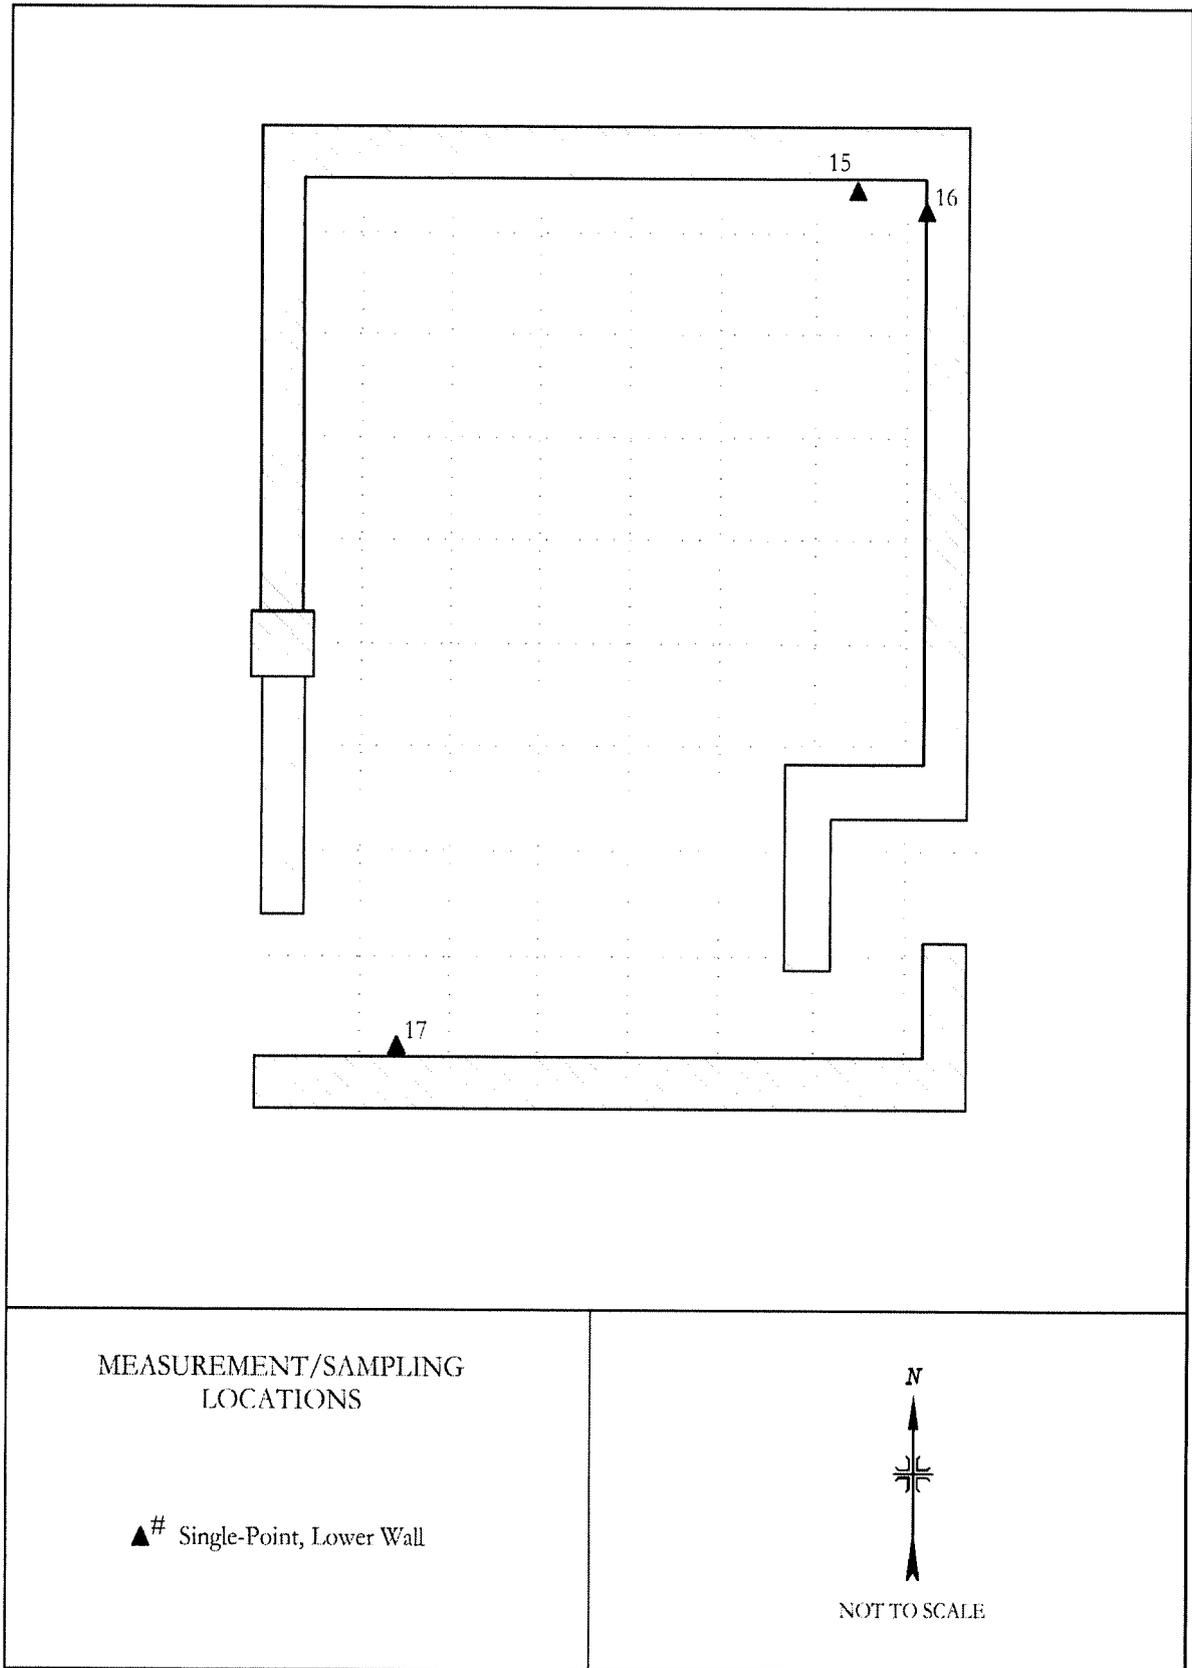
Auxiliary Building, Room 43 - Direct Measurement Locations
